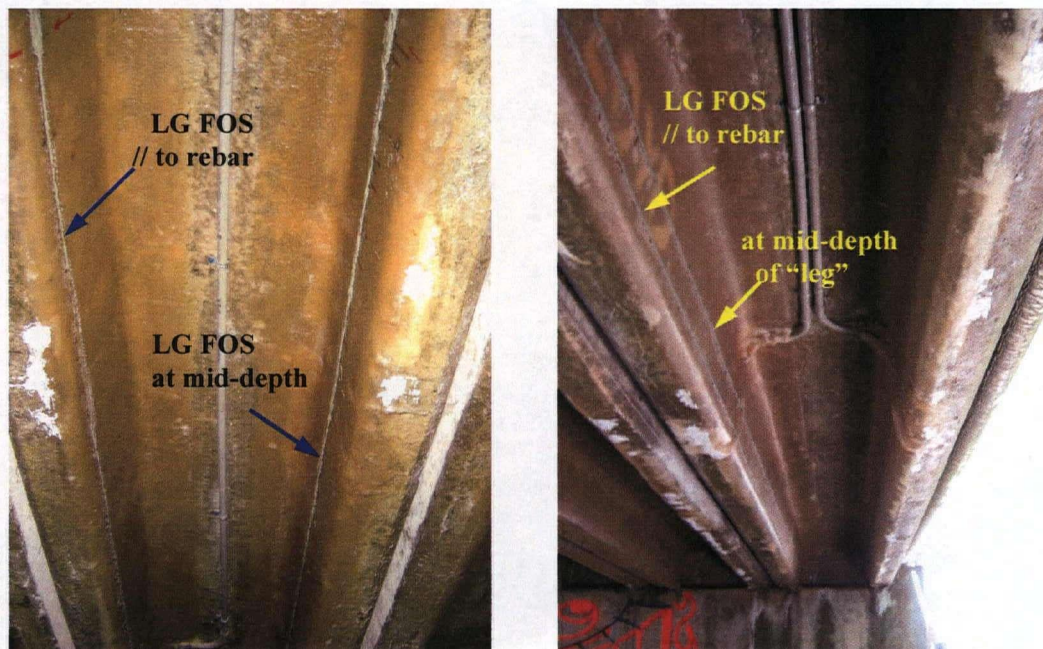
Photos of the 5 m-Long Gauge FOS Locations: (a) Girder 2 & 6; (b) Girder 10
